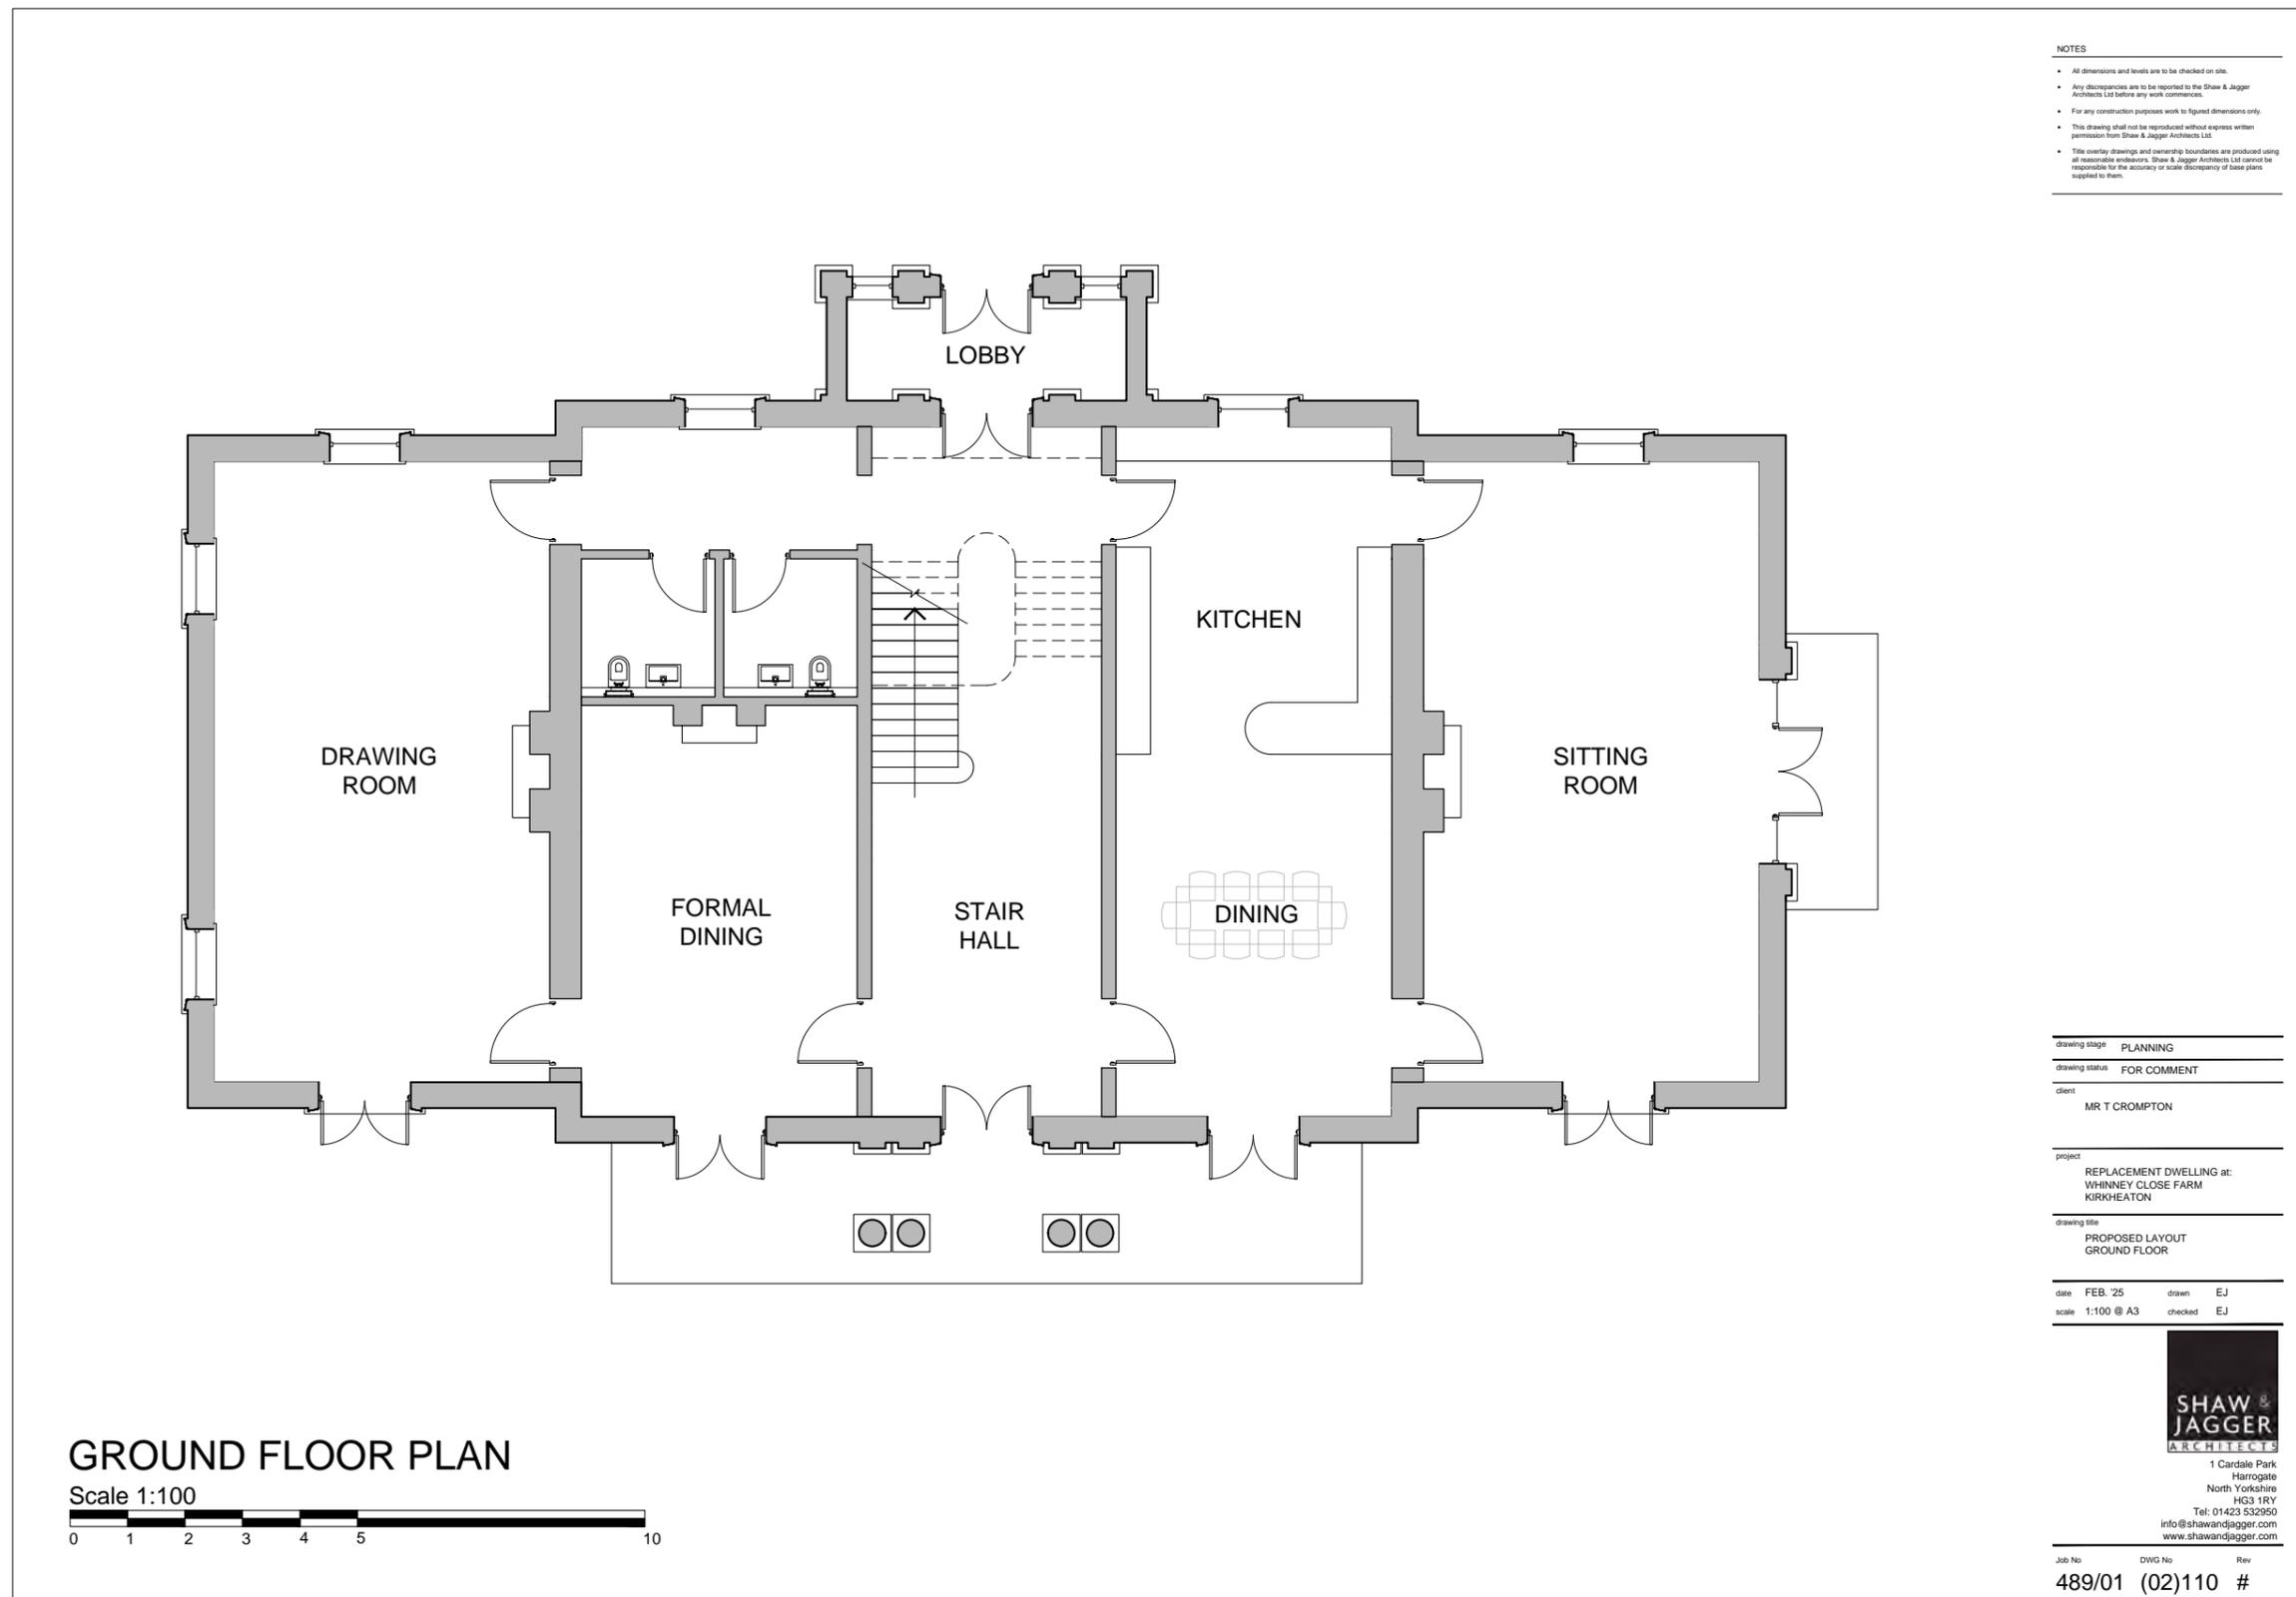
Proposed Ground Floor Layout (Not to scale)
